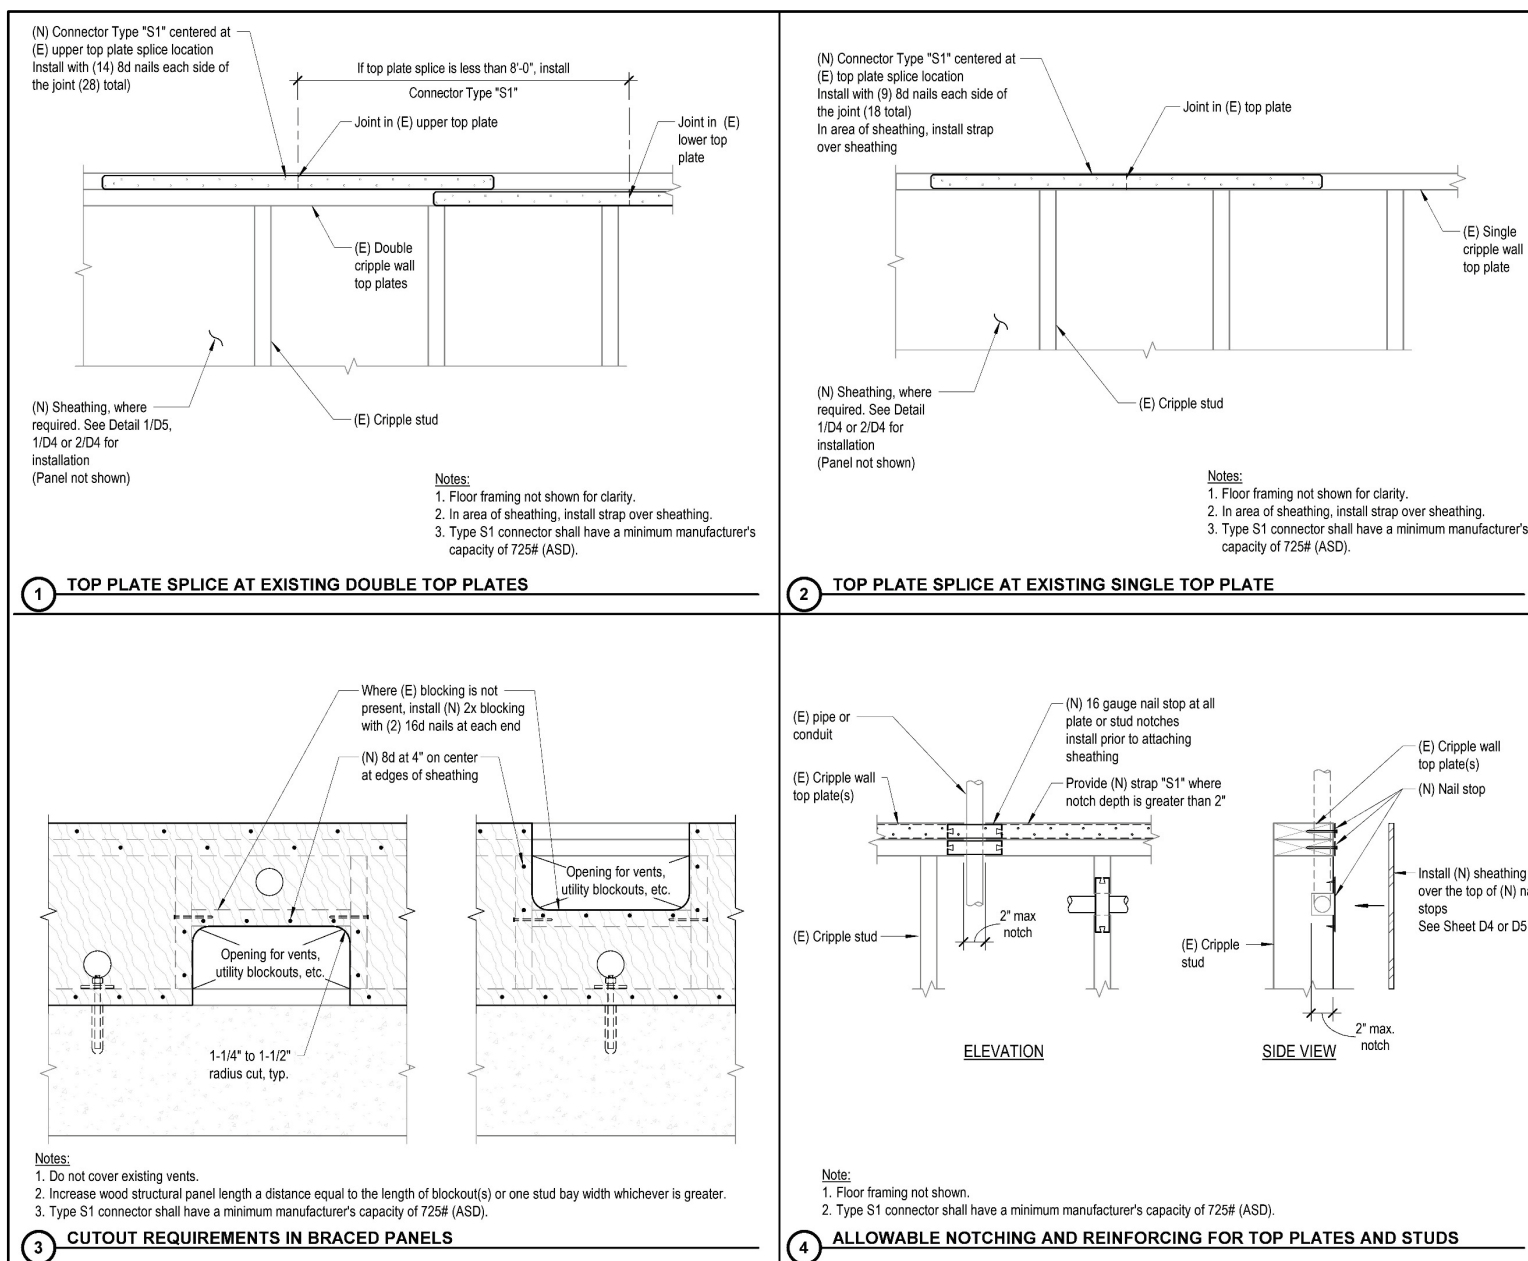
Vent openings and top plate details. Sheet D6.
